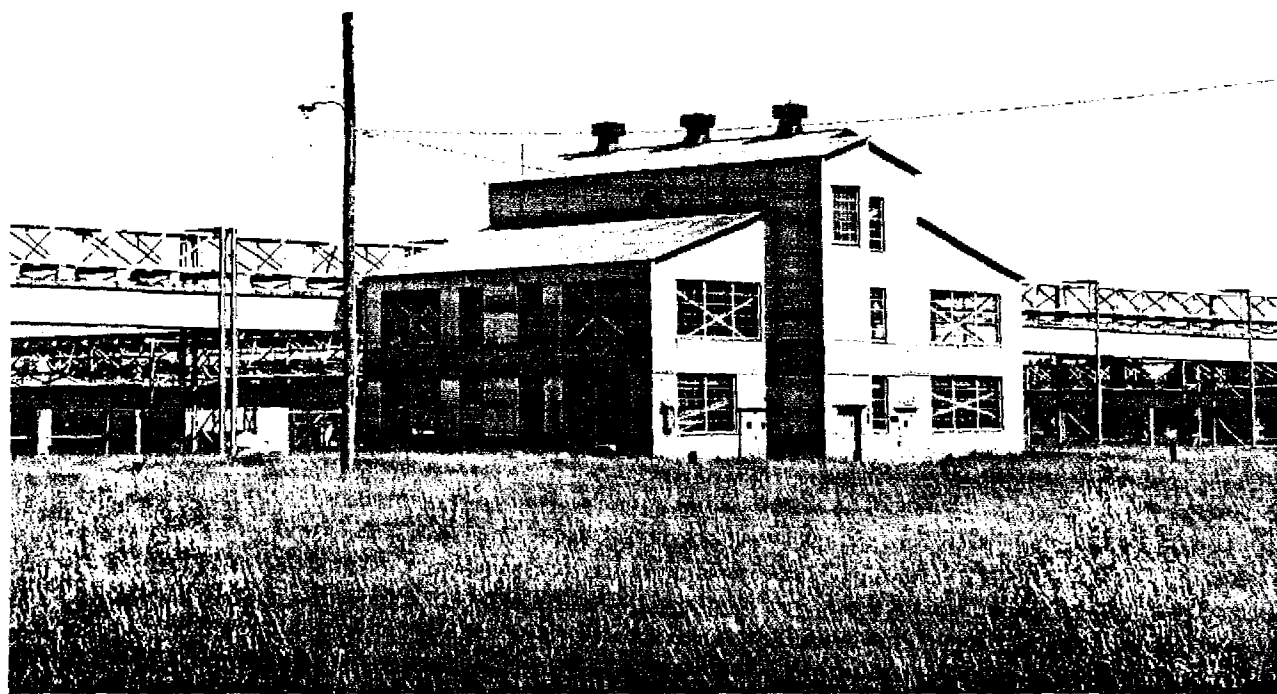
Typical reinforced concrete construction with glass and steel infill; ball powder Hardening and Weighing House. (Source: Field inventory photograph, Robert Ferguson, MacDonald and Mack Partnership, 1983)
